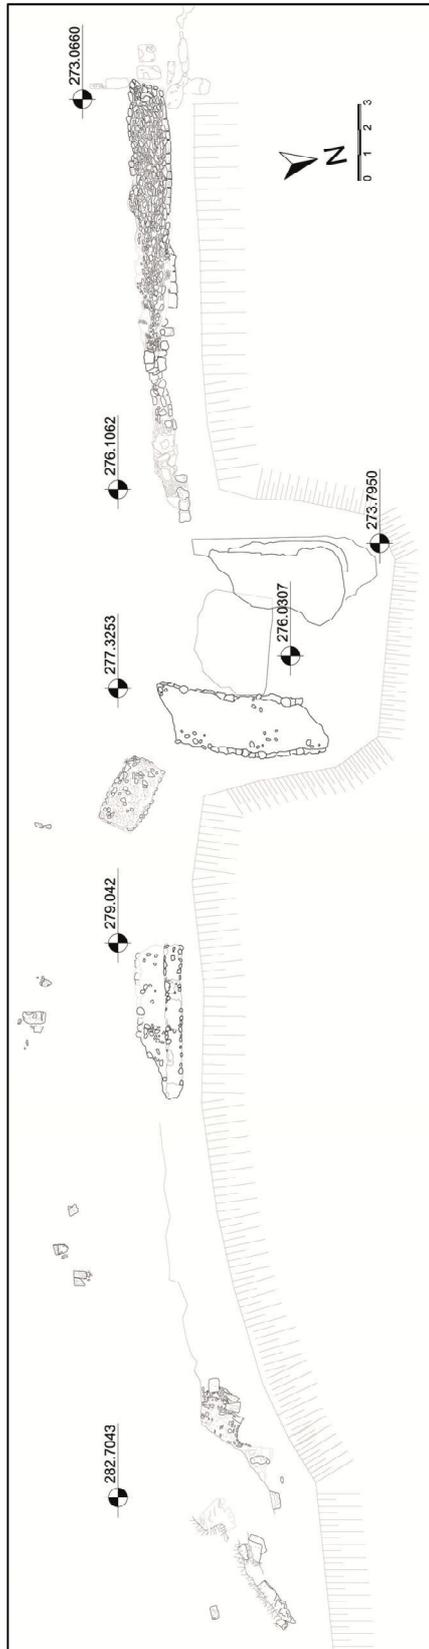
Independent walls, W2, T2, W3, plan, drawing by author (2014).
